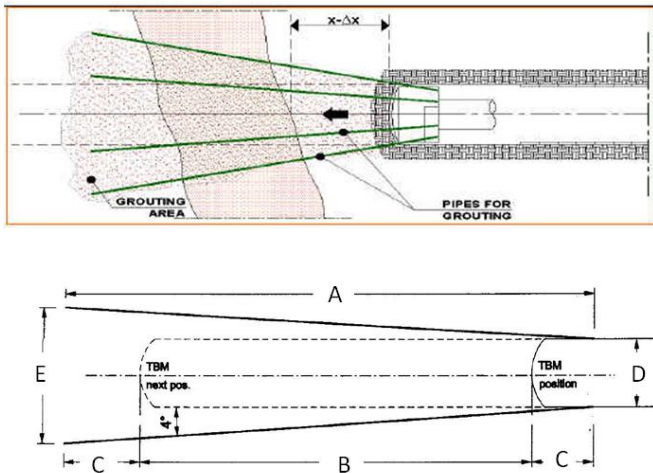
Illustration of grouting/drainage in advance of TBM excavation
